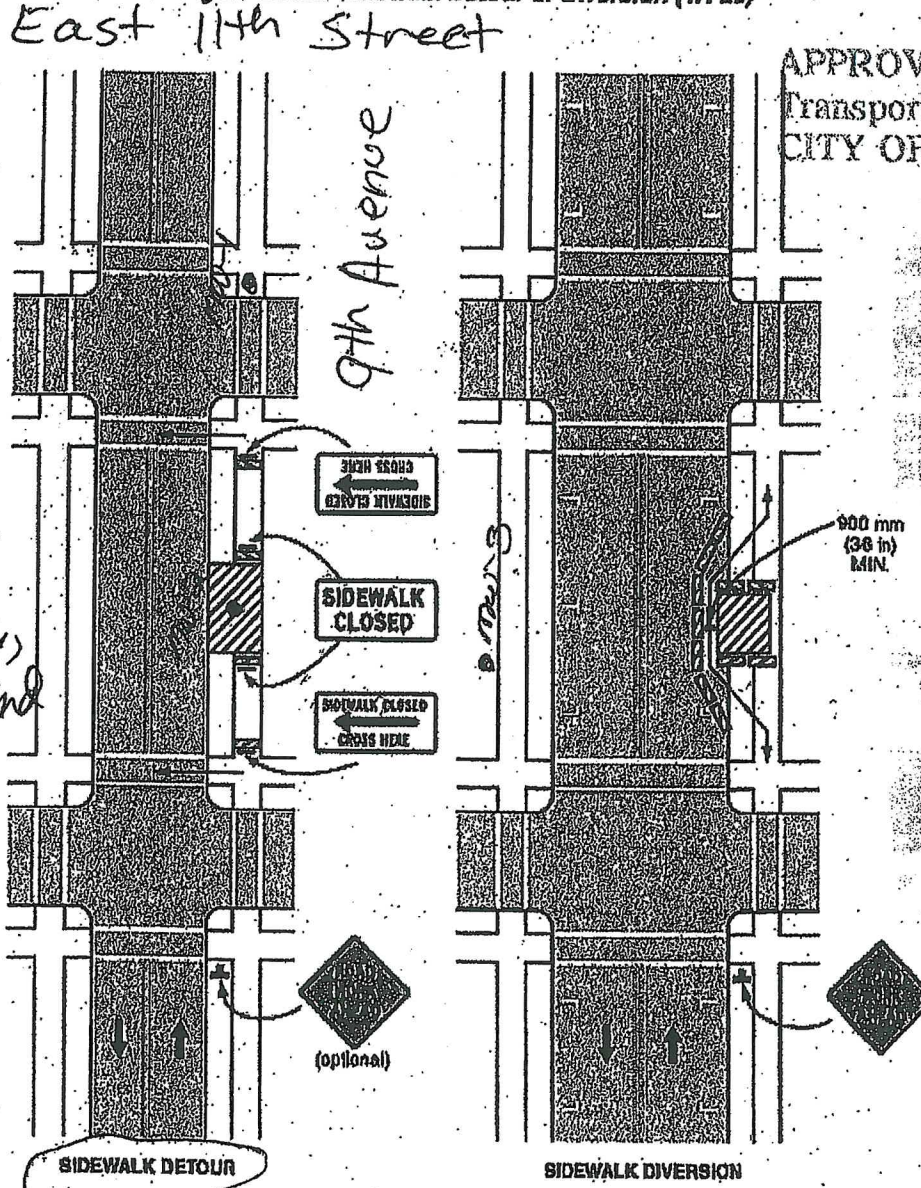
H-28. Sidewalk Detour or Diversion (TA-28)
